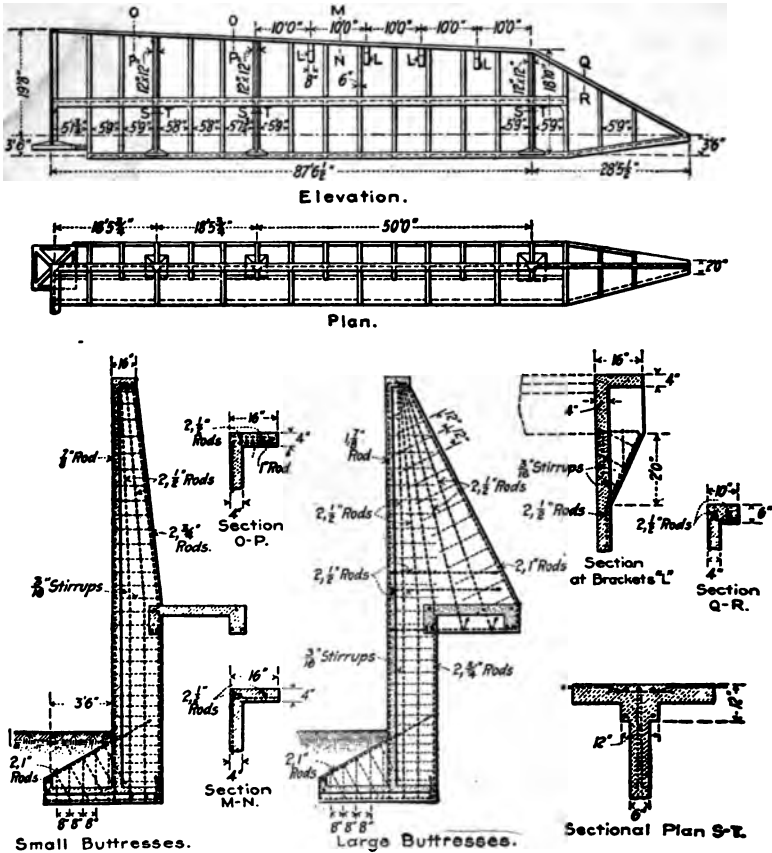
Retaining Wall with Counterforts, Atlanta Terminal Station.
